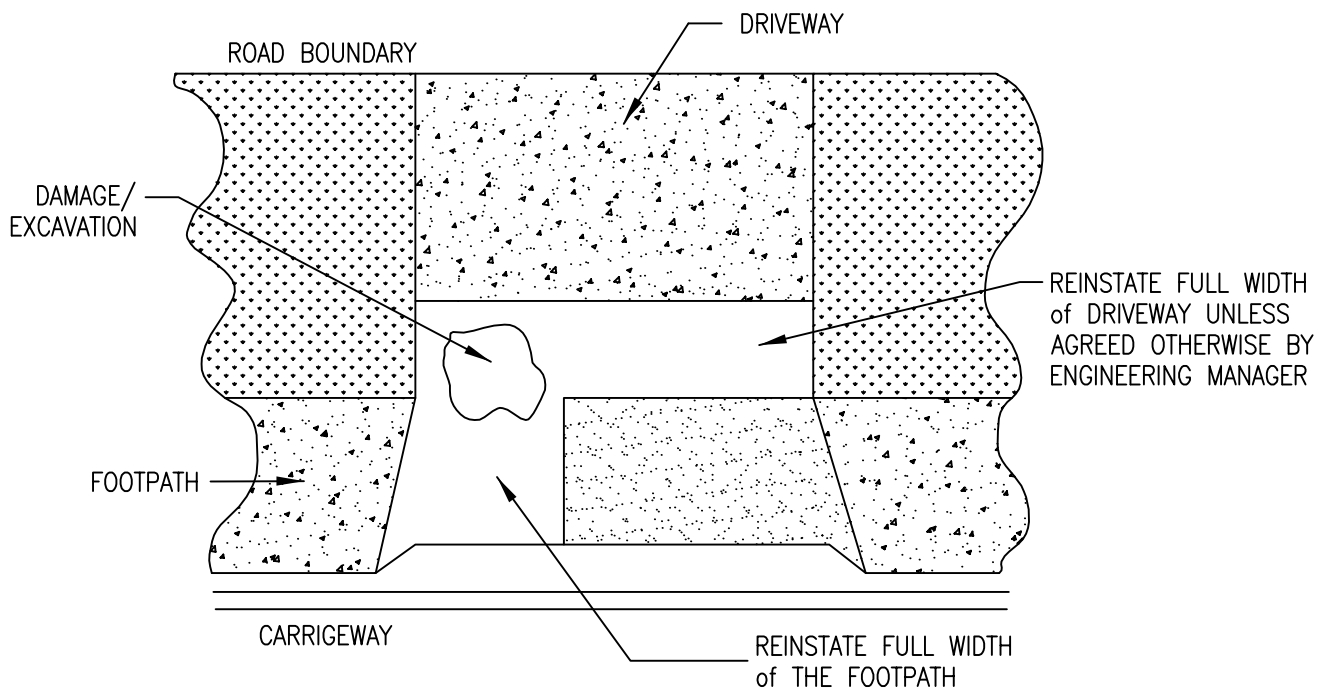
EXCAVATION IN FOOTPATH OR DRIVEWAY
